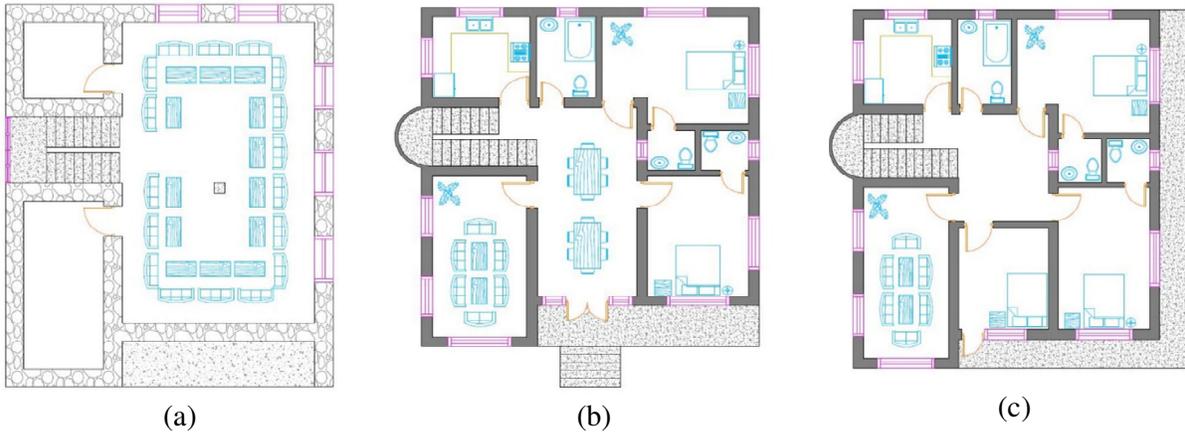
Plan and Elevation of the case study building (a) Basement plan, (b) Ground Floor plan (c) First floor plan
